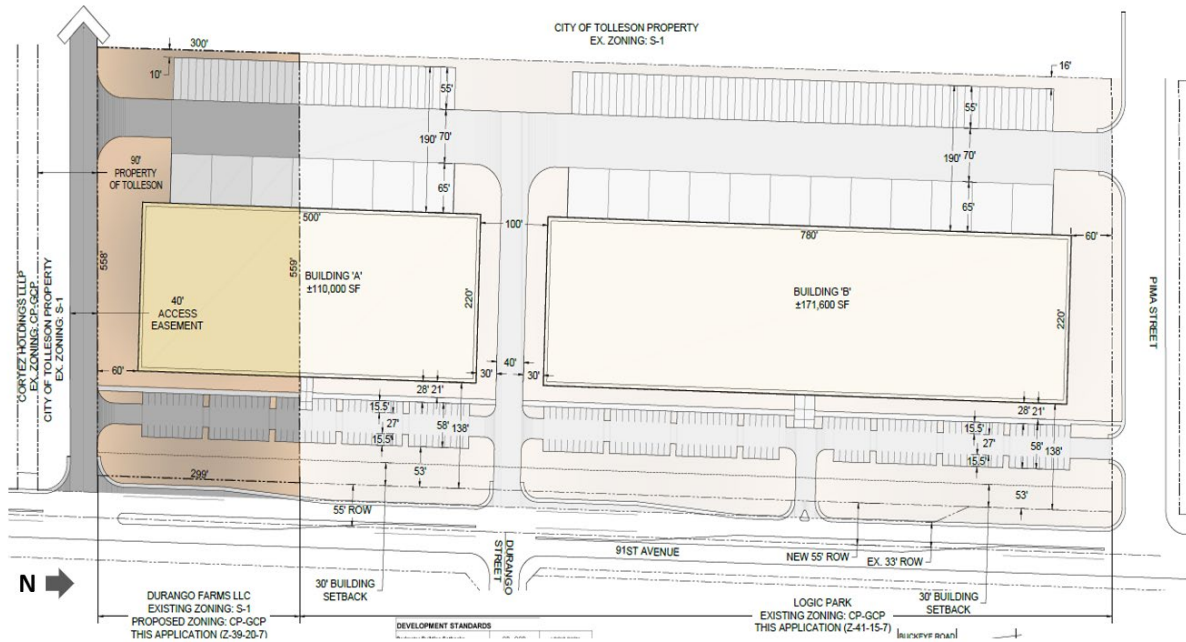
Figure C. (Above) Site Plan, Source: Gilmore Planning & Landscape Architecture with Planning and Development Department annotations.
